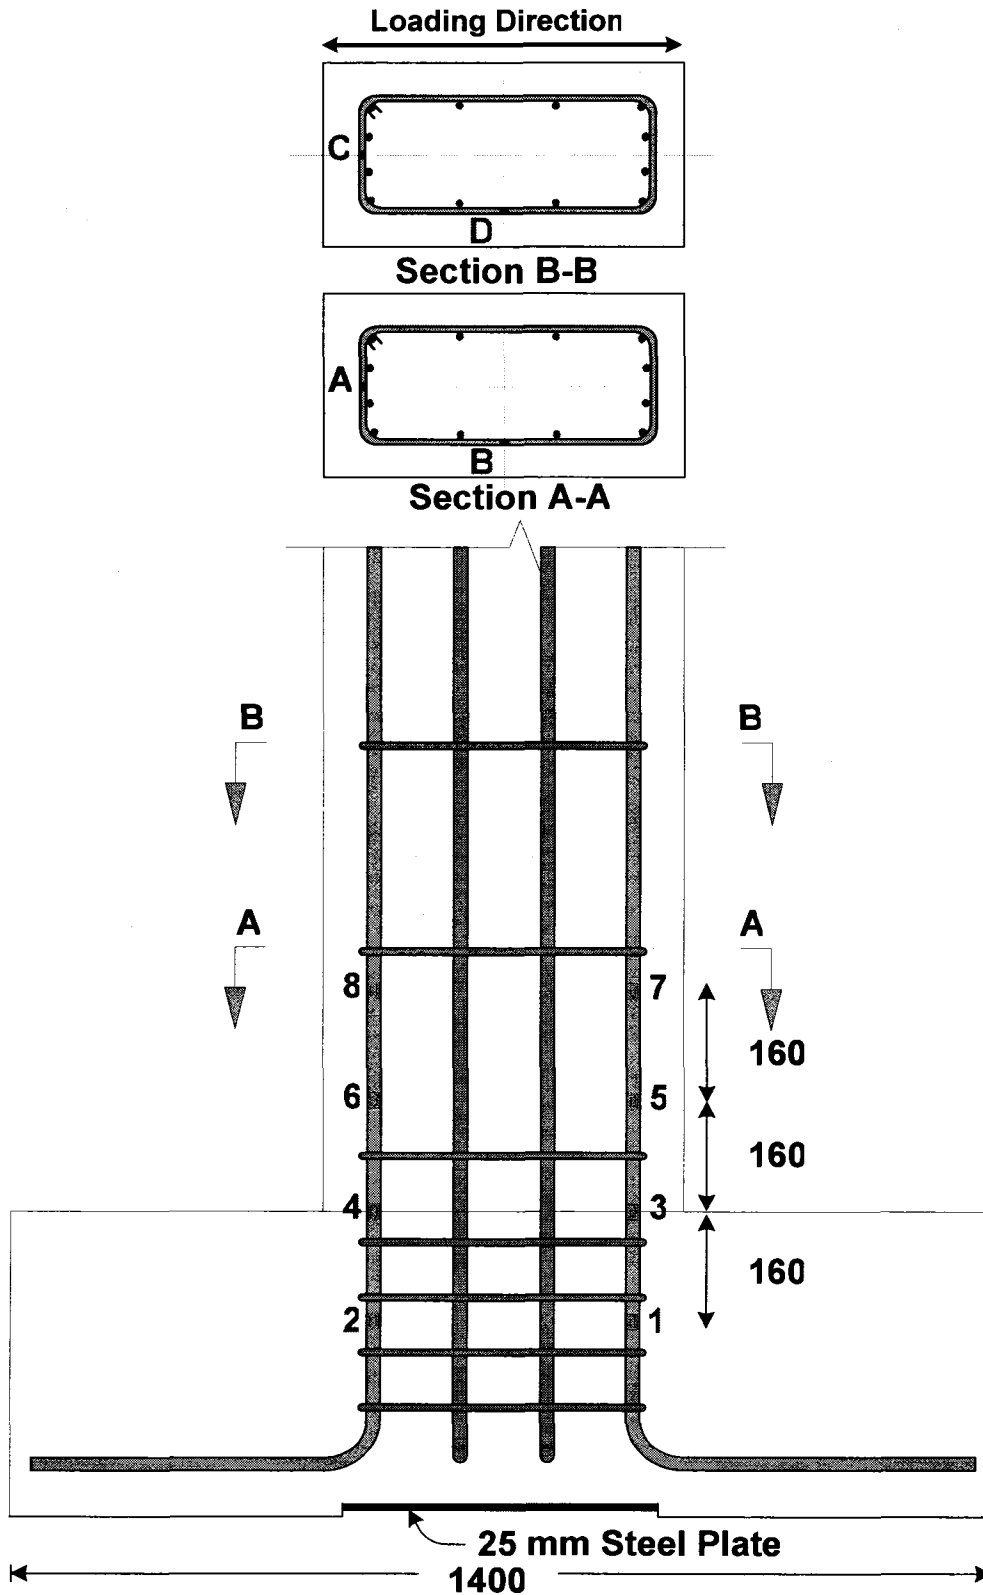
Strain gauge location on reinforcing steel for Columns LR-C and LR-R
